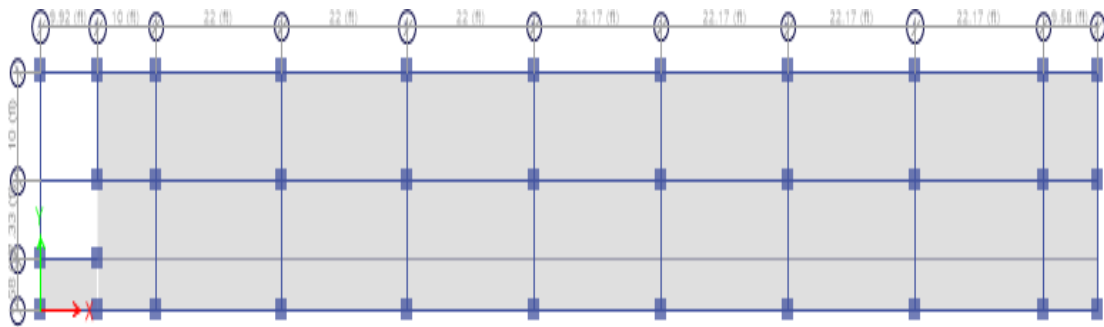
1 ETABS Plan View Showing Structural Grid and Bay Spacing
